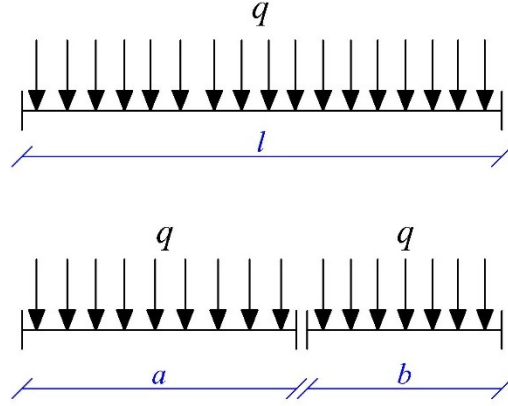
Alberta-sized transverse beam divided into mini-sized beams
